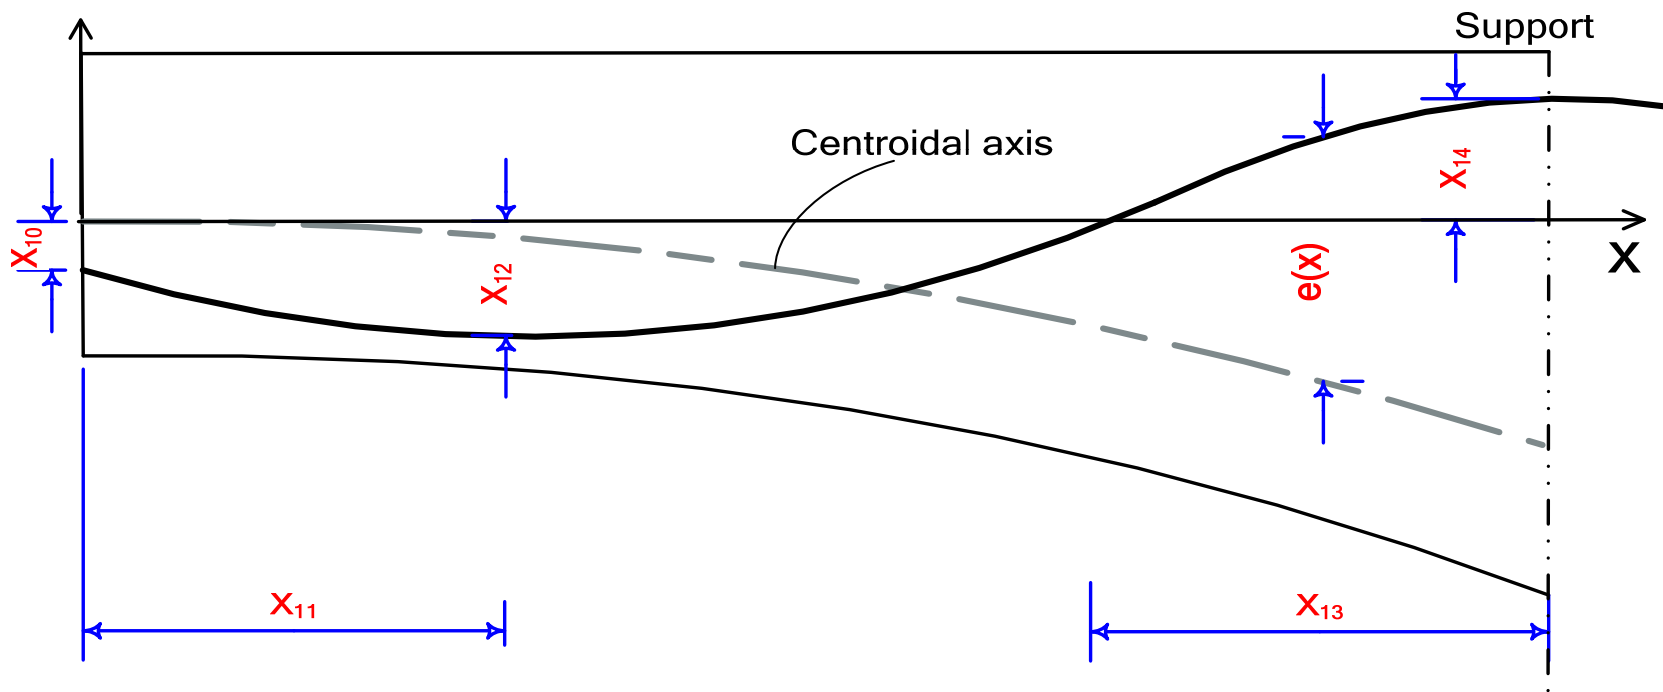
Design Variables in Exterior Span of Continuous Bridge girders
